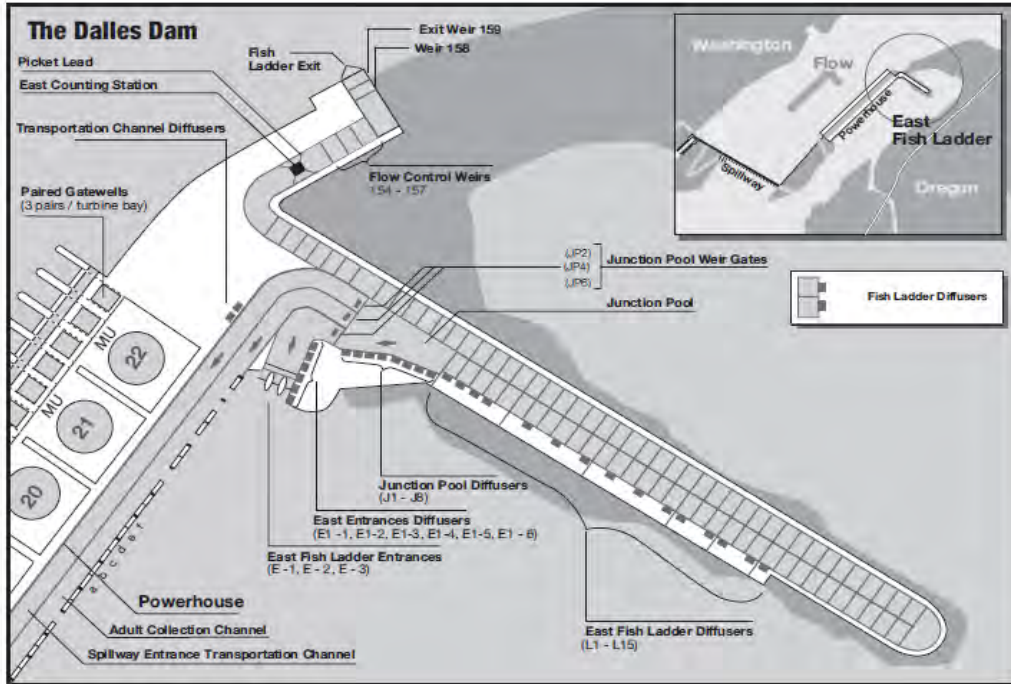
The Dalles Dam East Fish Ladder (USACE 2008)
